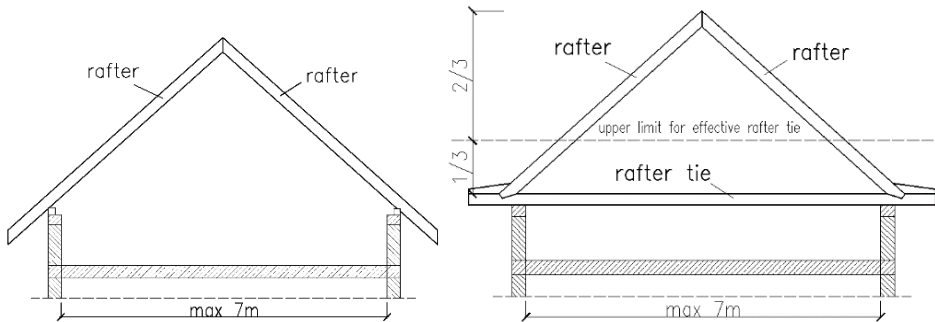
Rafter roofs. The drawings don't show the fasteners
